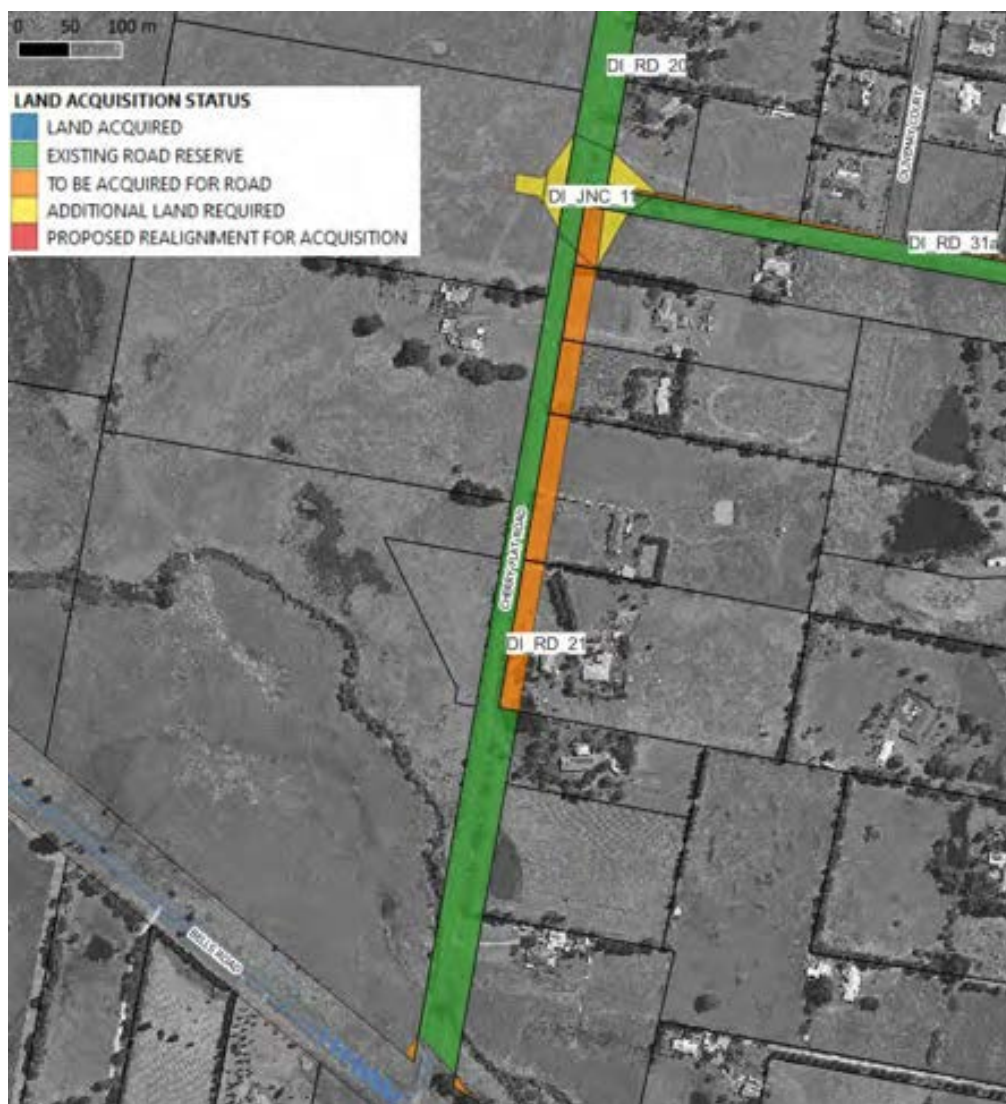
DI_RD_21 existing road reserve (green) and proposed widening (orange)
